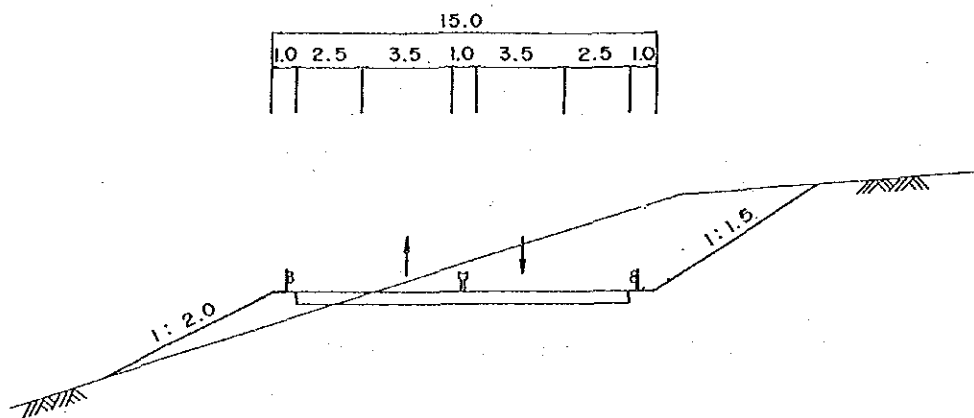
Typical Cross Section on Provisional Two Lane Staged Construction
